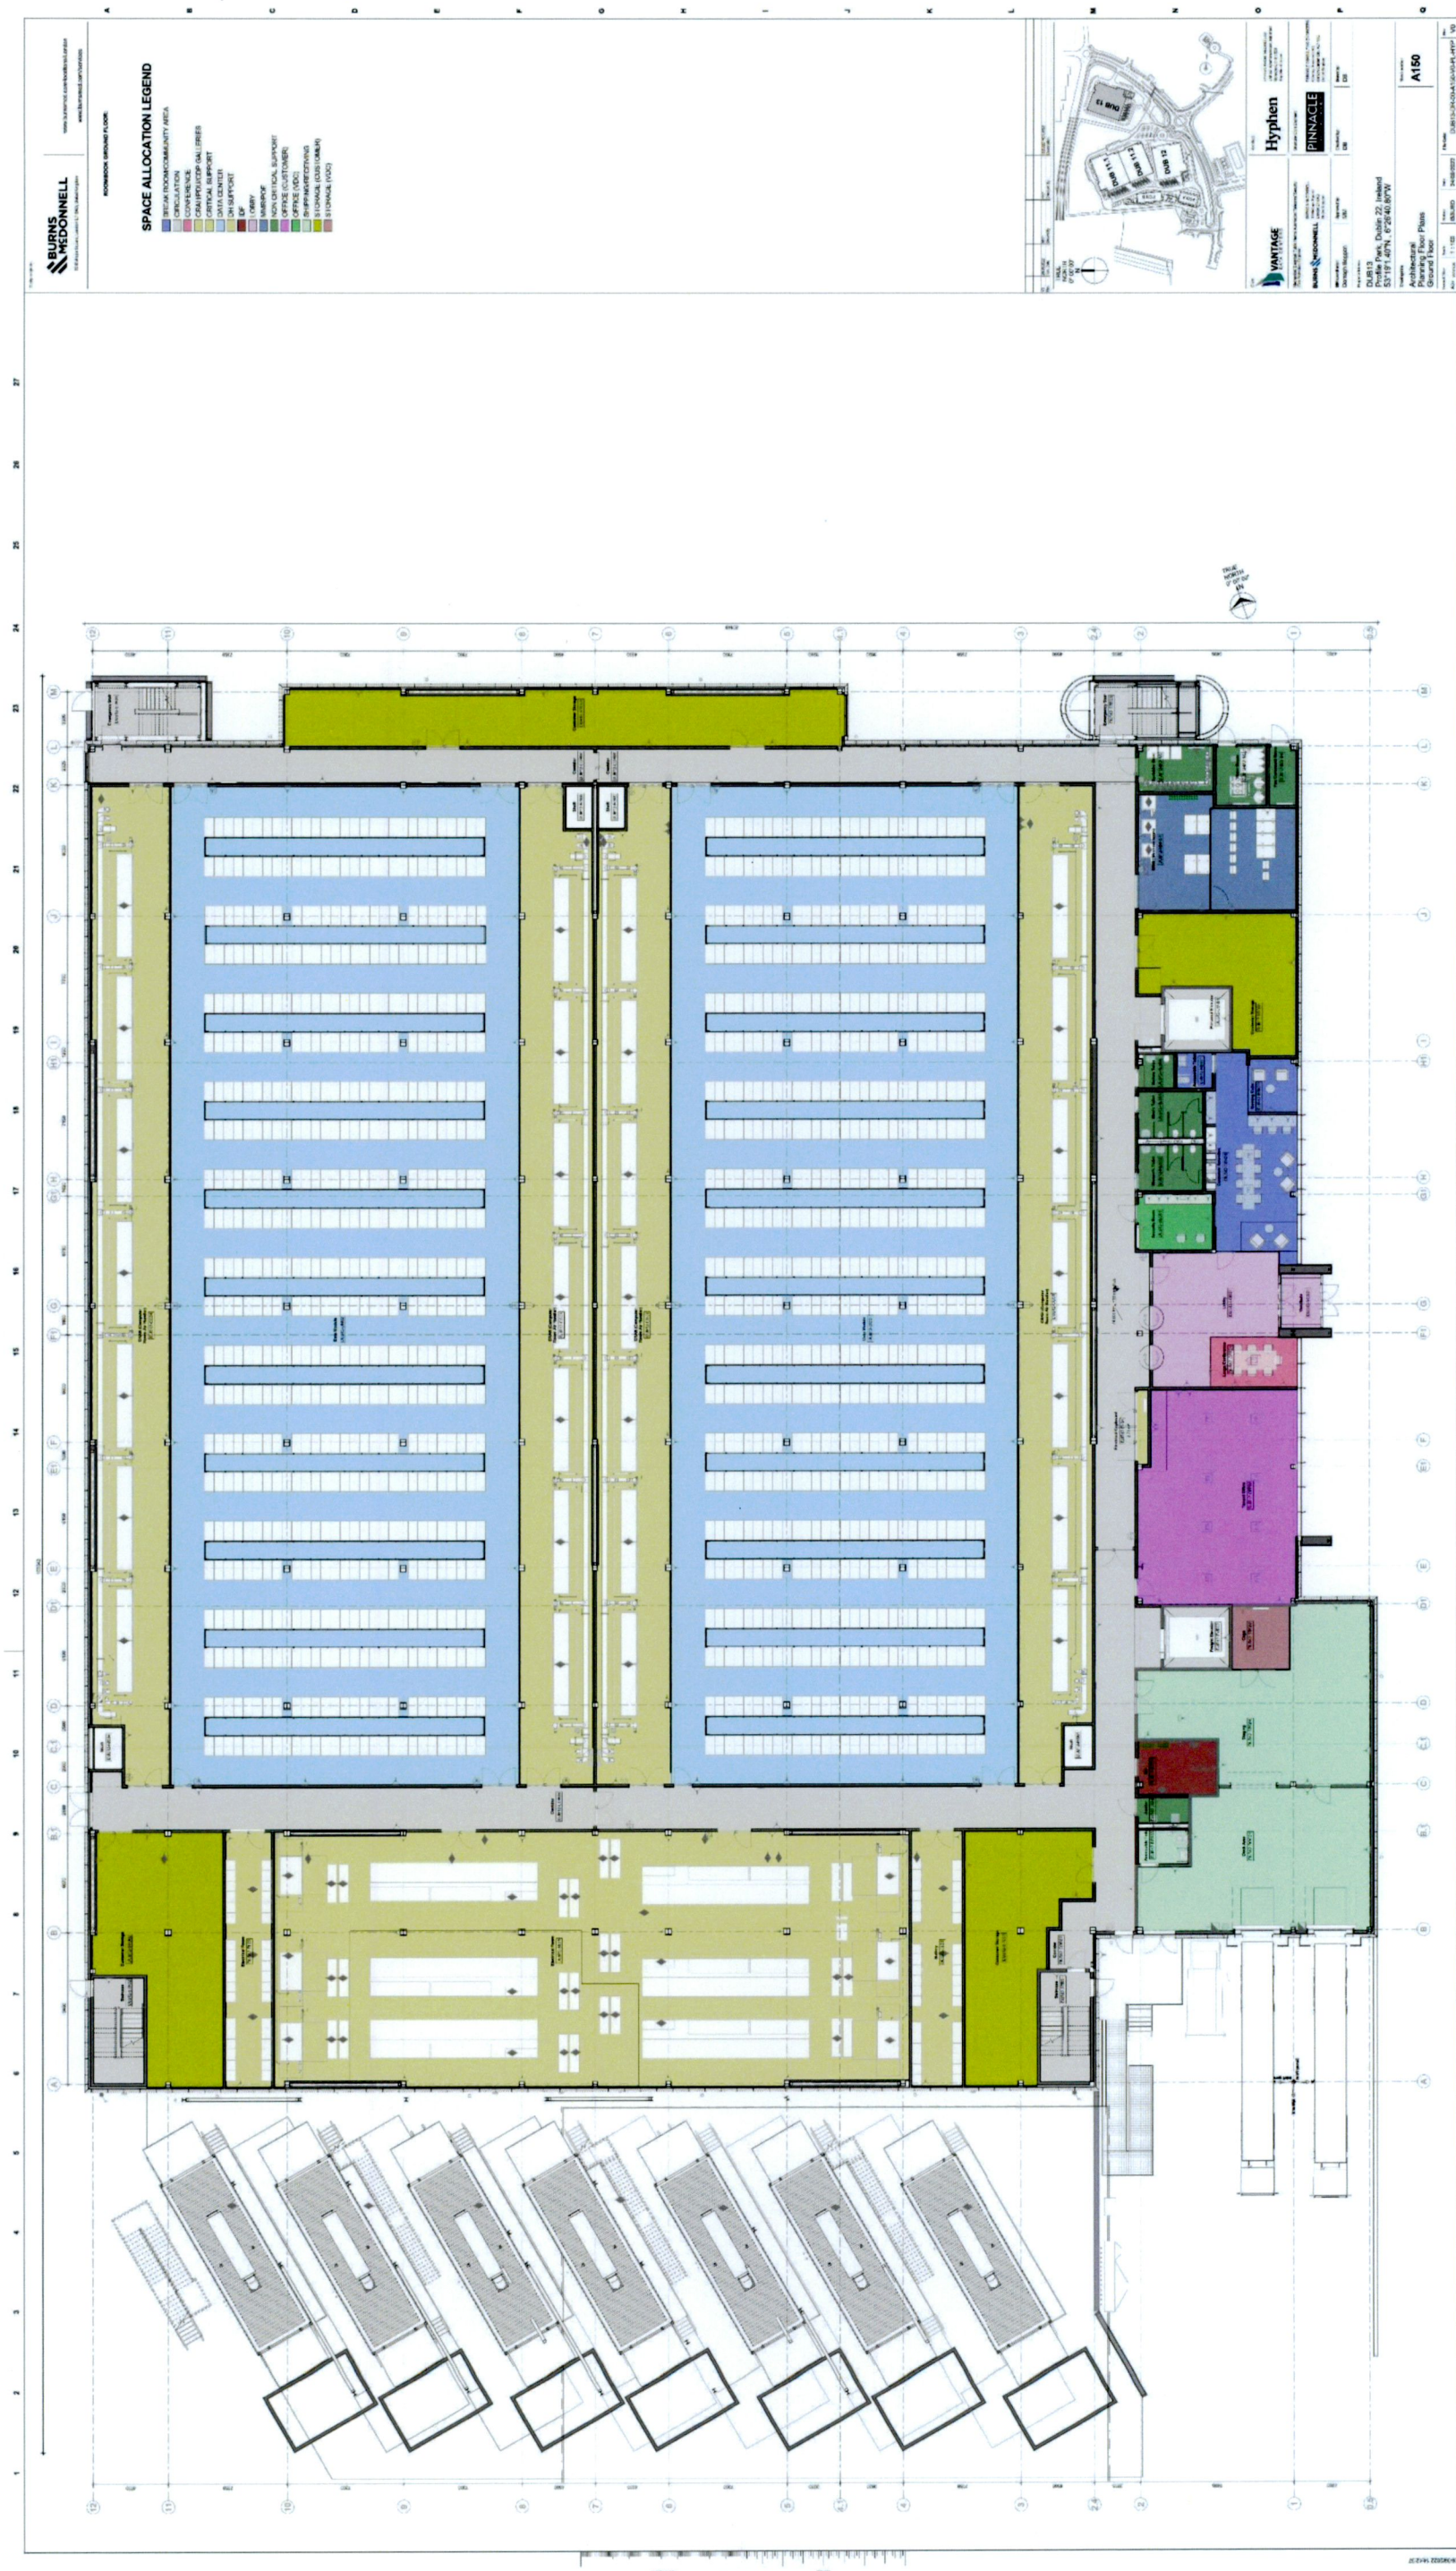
Proposed Ground Floor General Arrangement Plan (Source Burns & McDonnell)
